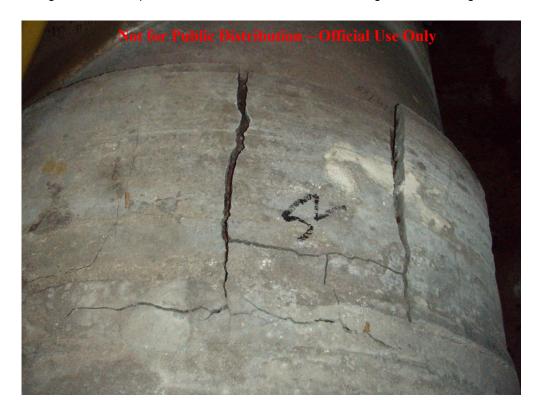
Centrifugal Concrete Pipe Joint Within Sheffield Tunnel Showing Major Cracking
